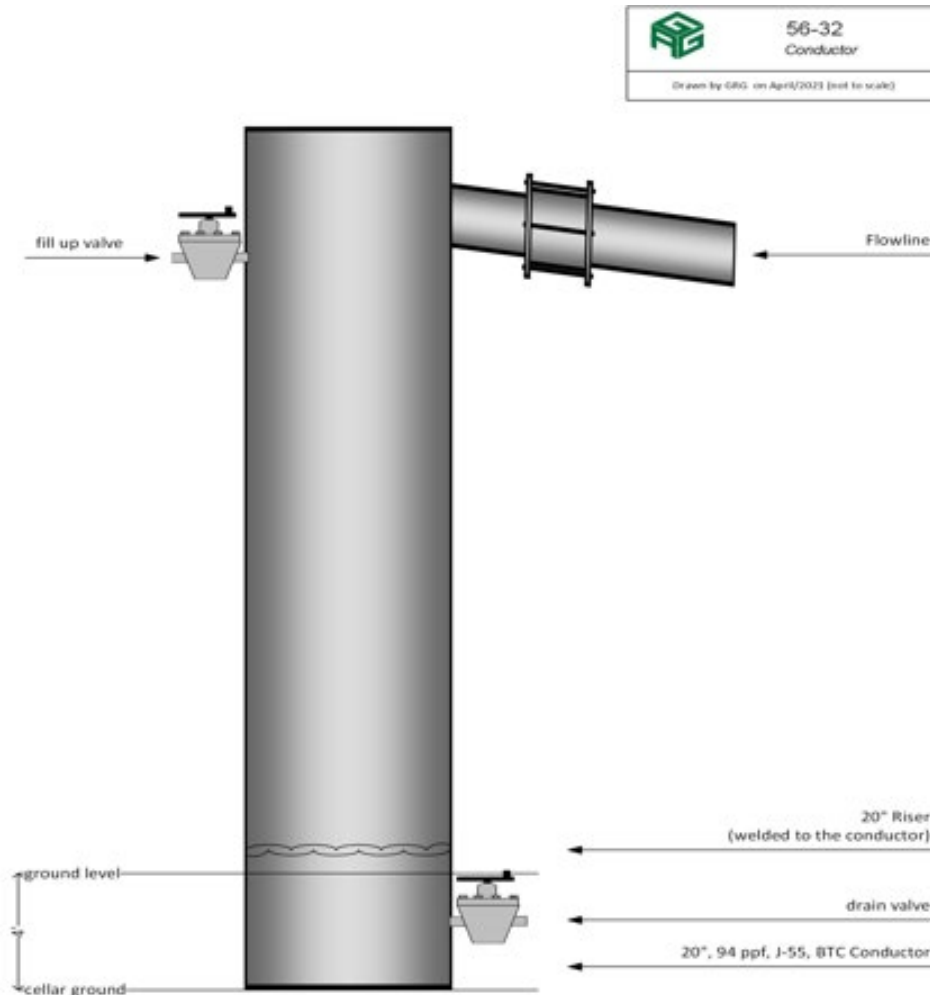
20 in. Conductor stack, used for drilling 17-1/2 in. hole.
